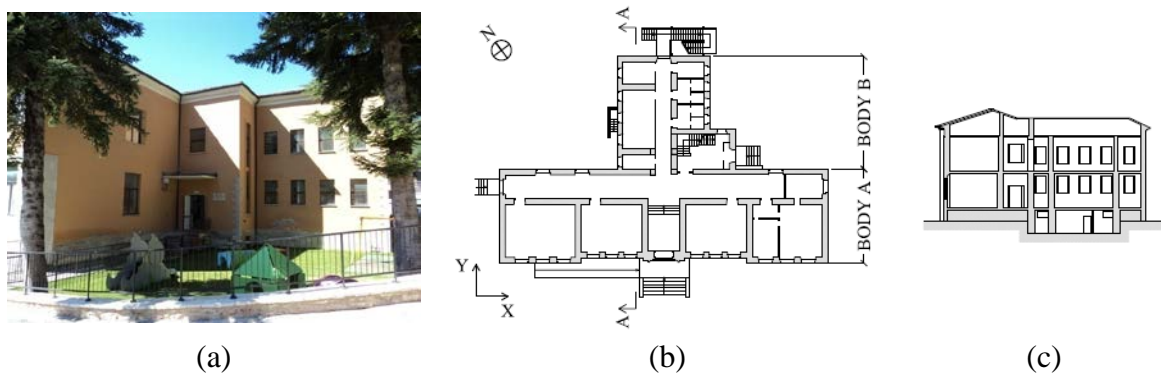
“Pietro Capuzi” school: (a) external view, (b) plan of the raised ground floor, and (c) section AA [2].
